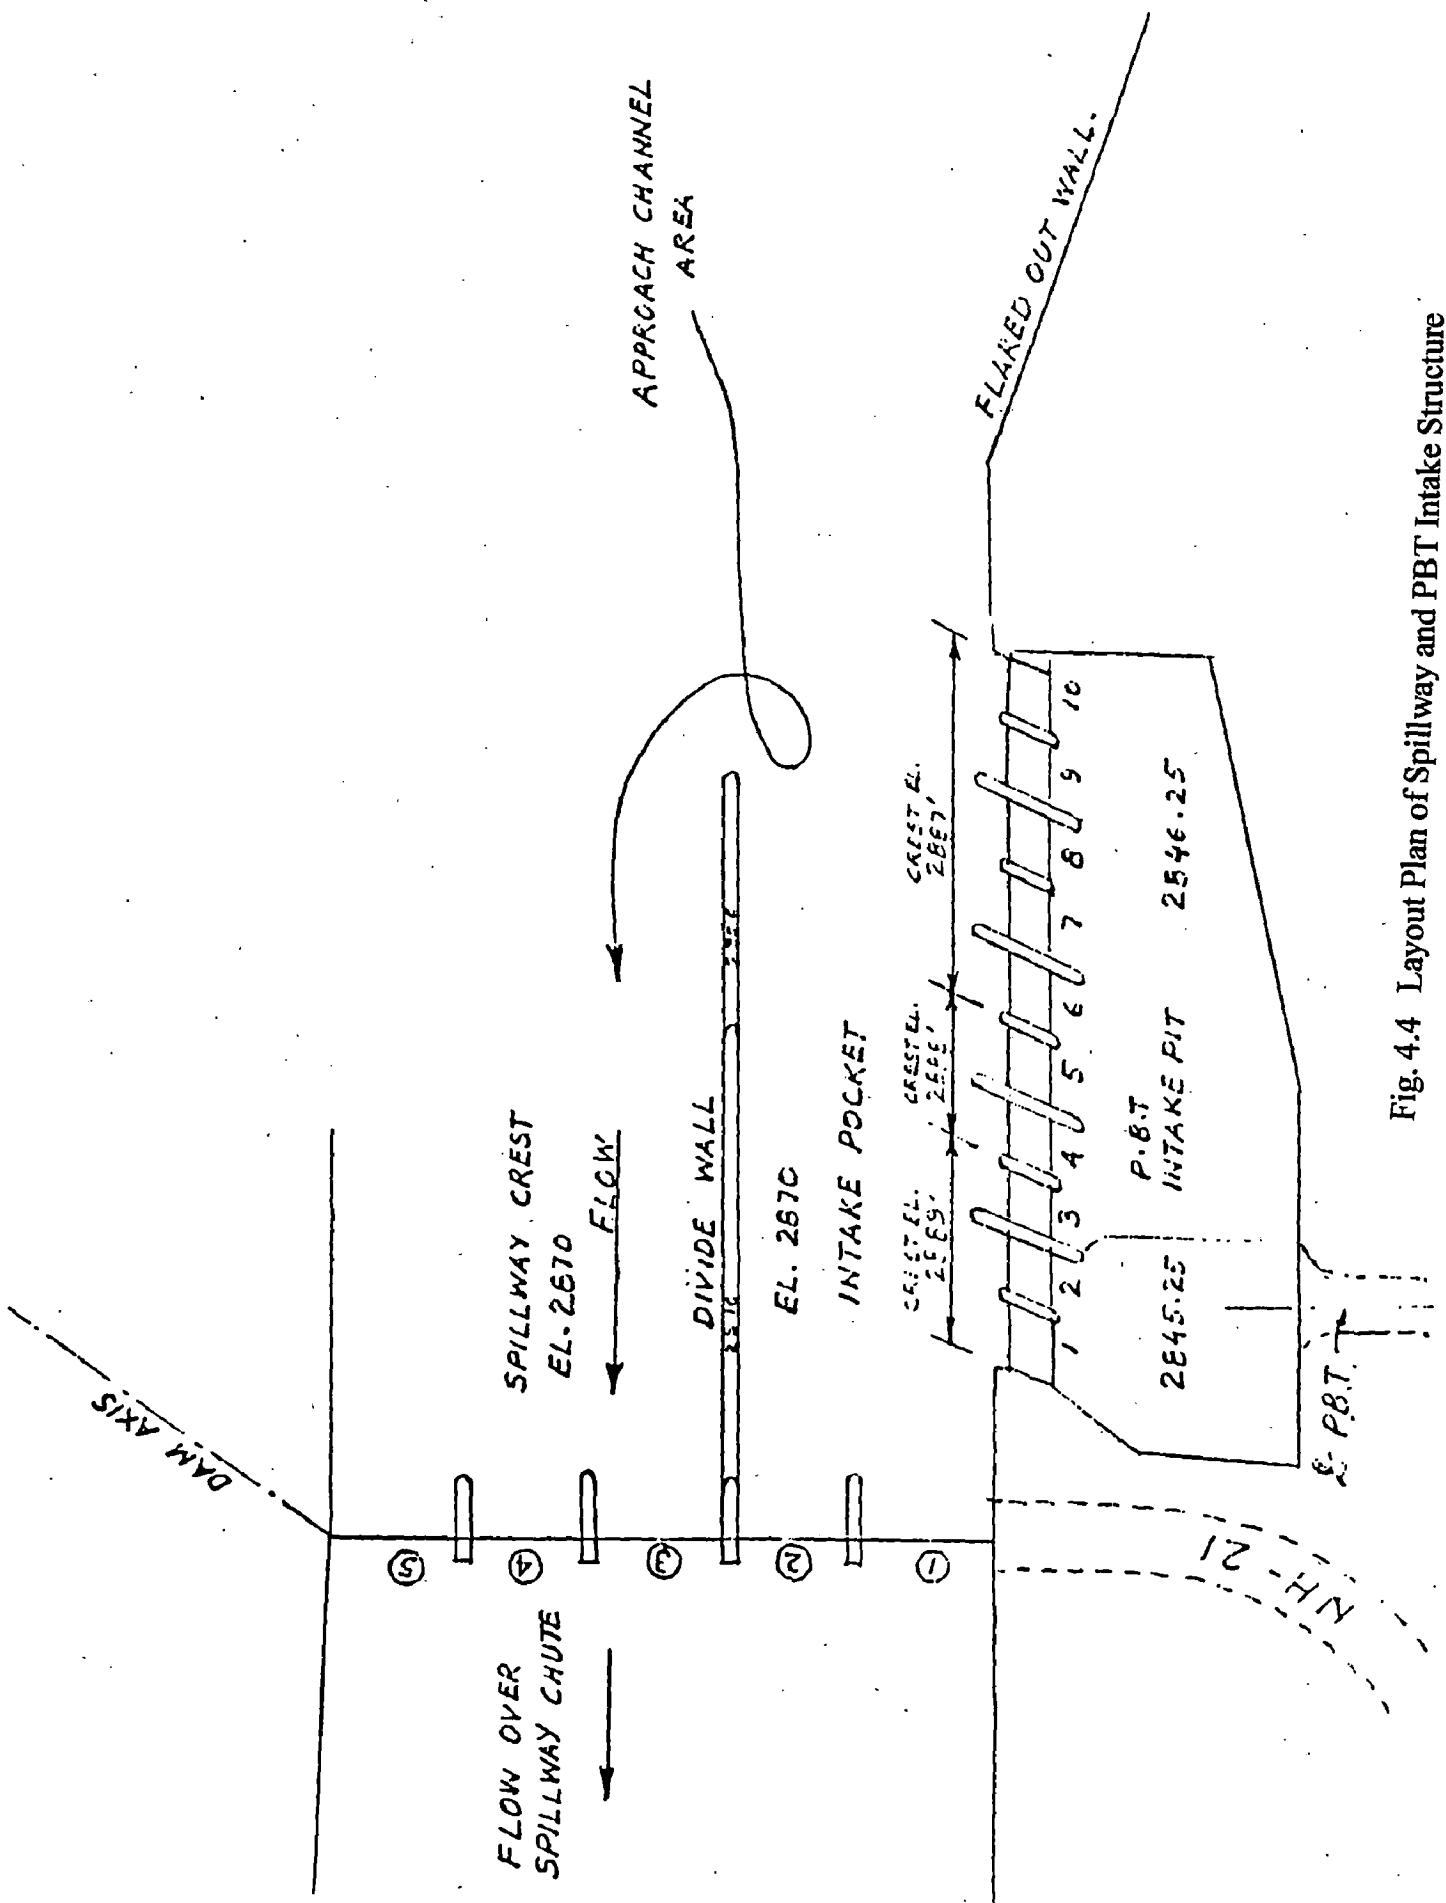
Layout Plan of Spillway and PBT Intake Structure
